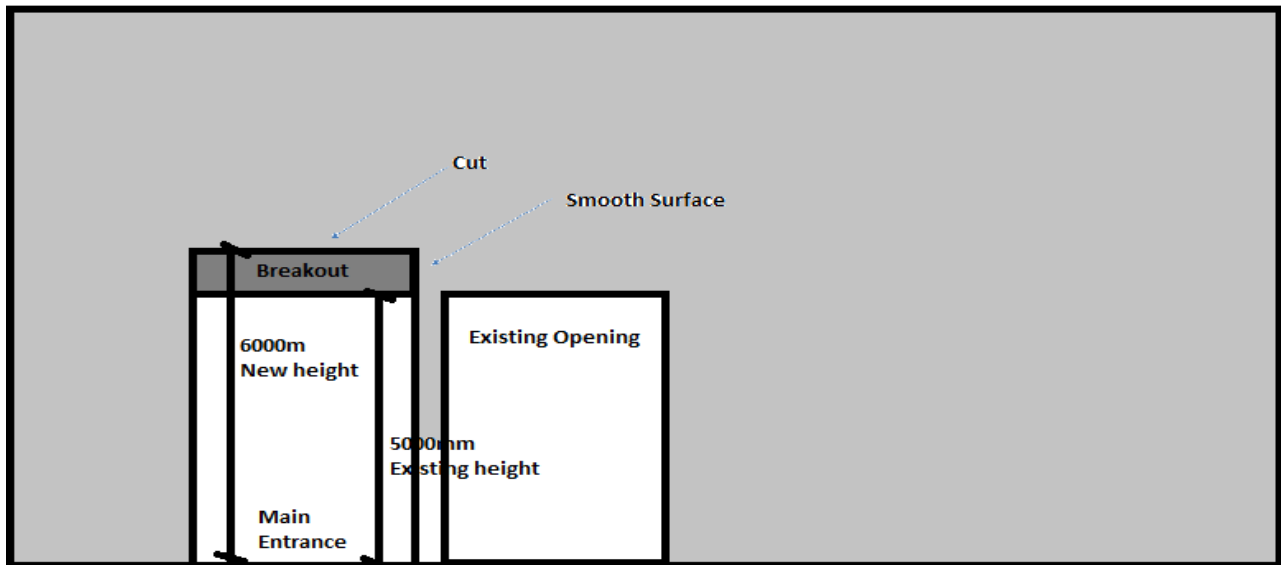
Marking out of the LLW Building Outer Wall (Gridline DI)
